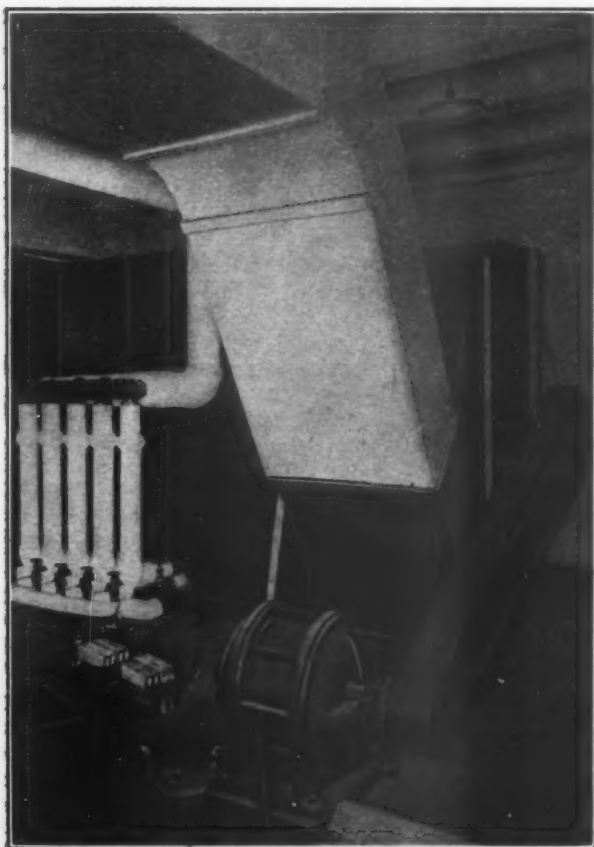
The Heating and Ventilating Equipment in the Yonkers Power House of the New York Central & Hudson River Railroad Company.
